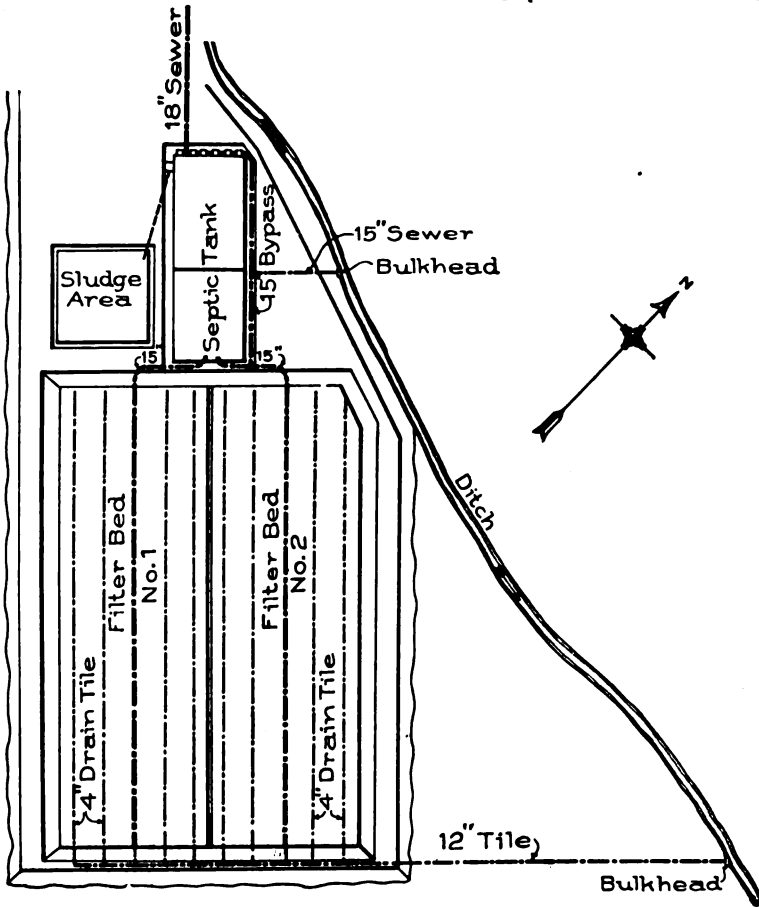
Plan of Sewage-Disposal Plant, Carroll, Iowa.
